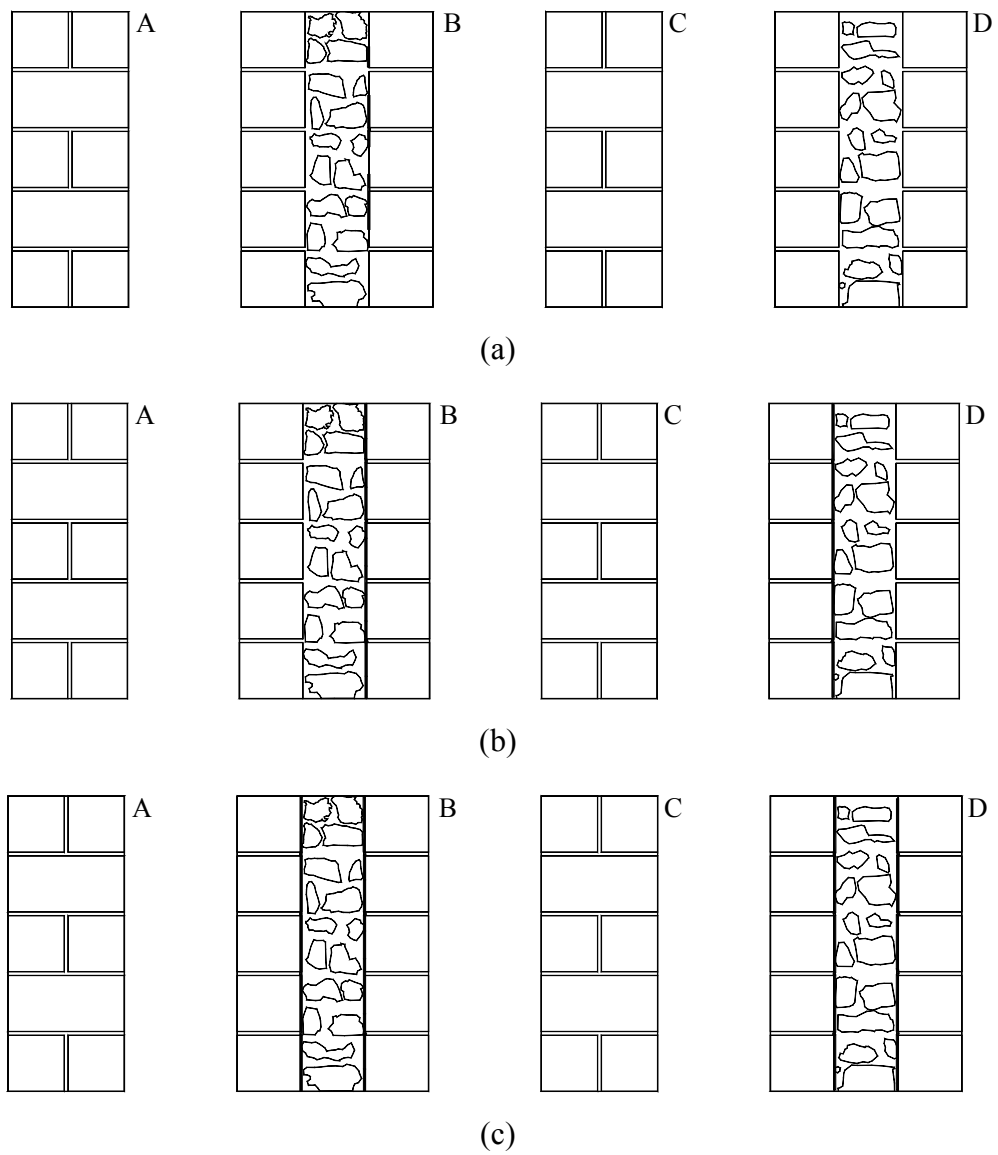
Crack pattern for SS2 at: (a) 25 kN (78% of f_c), (b) 32 kN (peak load - failure of the first connection) and (c) 25 kN (failure of the second connection).
